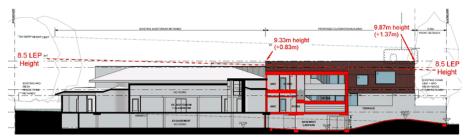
Section showing height of building & maximum 8.5m LEP Height
